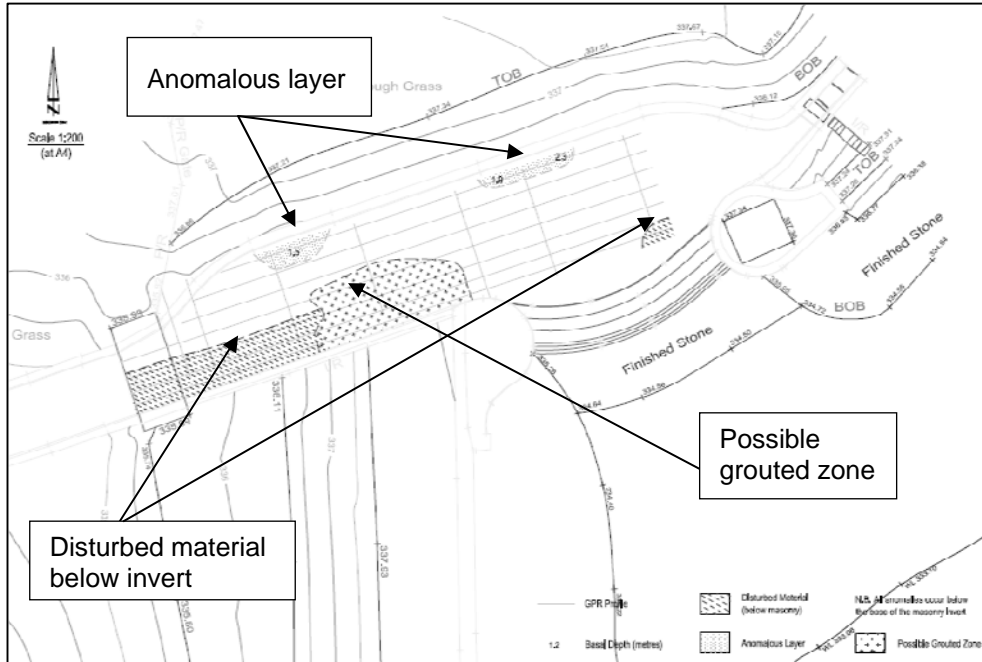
Tumblebay GPR Interpretation Plan (courtesy of Subsurface Geotechnical).
